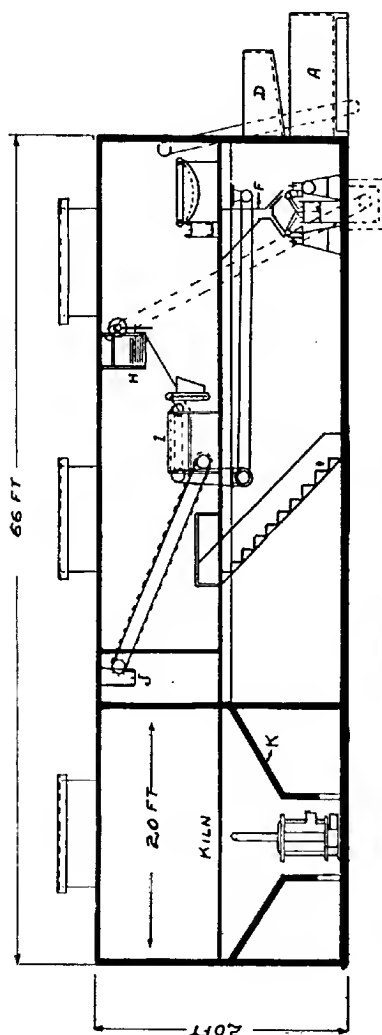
Fig. X.—Sectional View of Plant, showing Arrangement of Conveyors.
